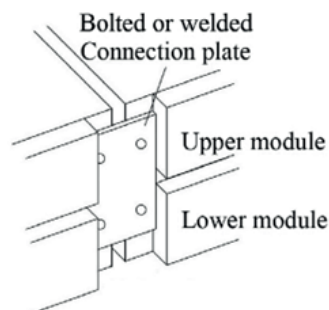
Connection using tie plate (bolted or welded)
